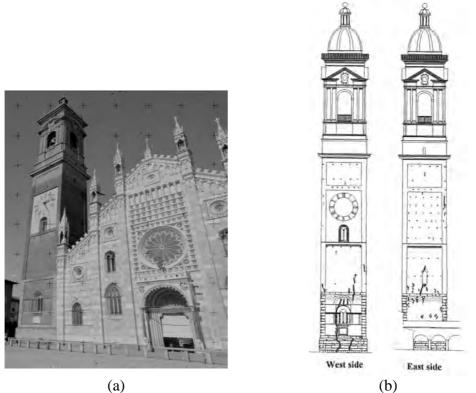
(a) Tower and Cathedral of Monza; (b) west and east façades
